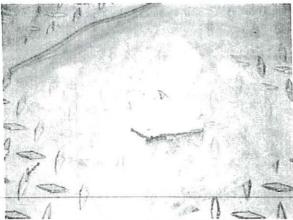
Photo of asbestos containing Floor Tile – Beige, Sample 20A.
